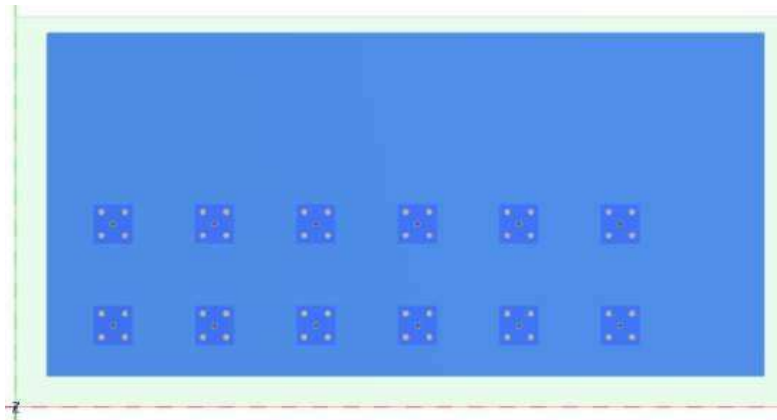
Top view of the pile foundation layout in PLAXIS 3D
